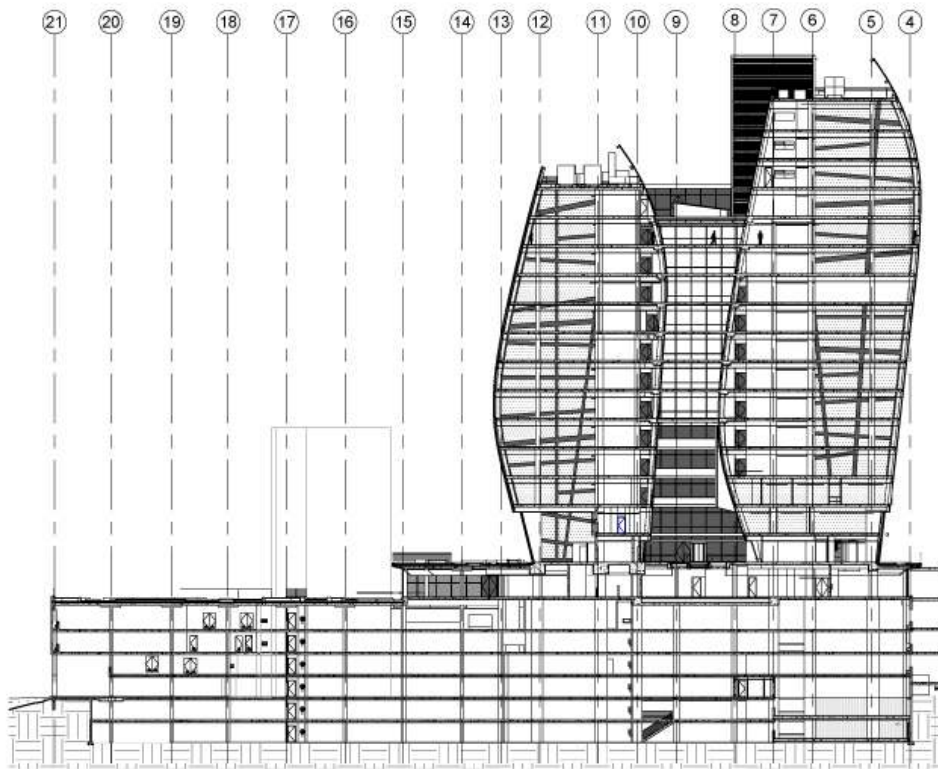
Drawing section of Norton Rose, 15 Alice Lane Towers indicating 6 levels of parking, the atrium and towers. (courtesy Paragon Architects)
